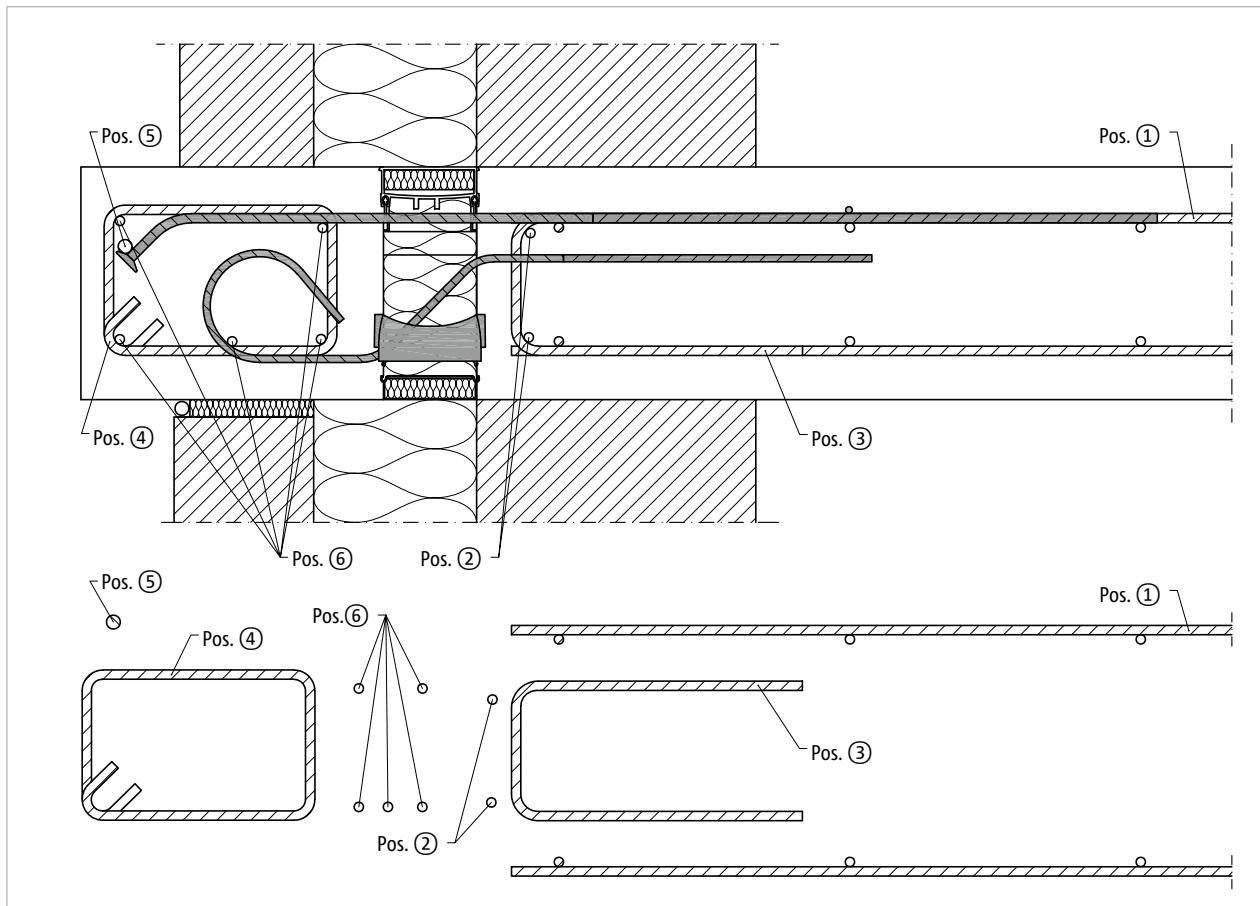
Schöck Isokorb® Type CO: Cross section of recommended cast-in-place reinforcement
